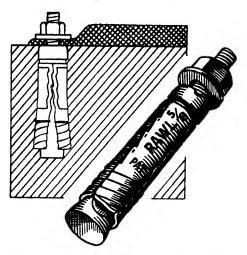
Fig. C.—Rawlbolt used for fixing Heavy Objects, such as Machinery.
